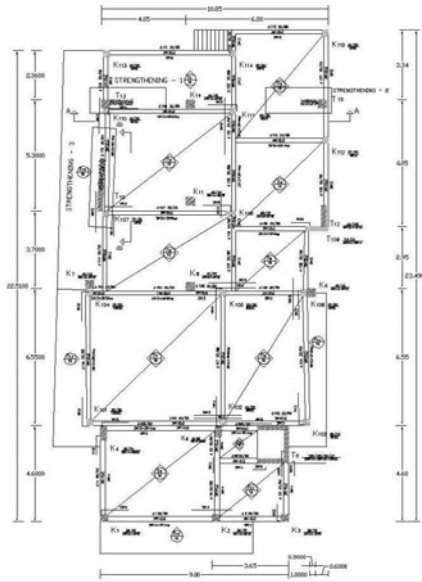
A: Plan View at the Elevation 3.50 m Showing Slabs and Beams of the 1960 Structures and the Vertical Elements of Both Structures
